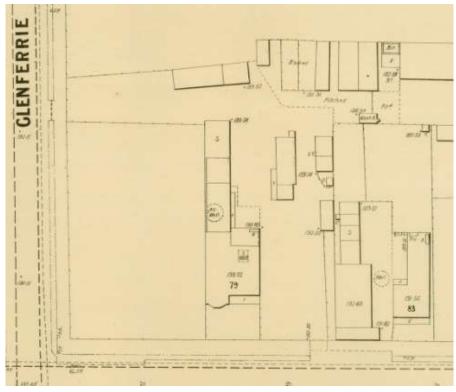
MMBW Detail Plan No 1774 showing the vacant land at the corner of Malvern and Glenferrie roads, and the house at 79 Malvern Road, 1907. At this stage the dairy buildings were located to the north of the house (SLV)
